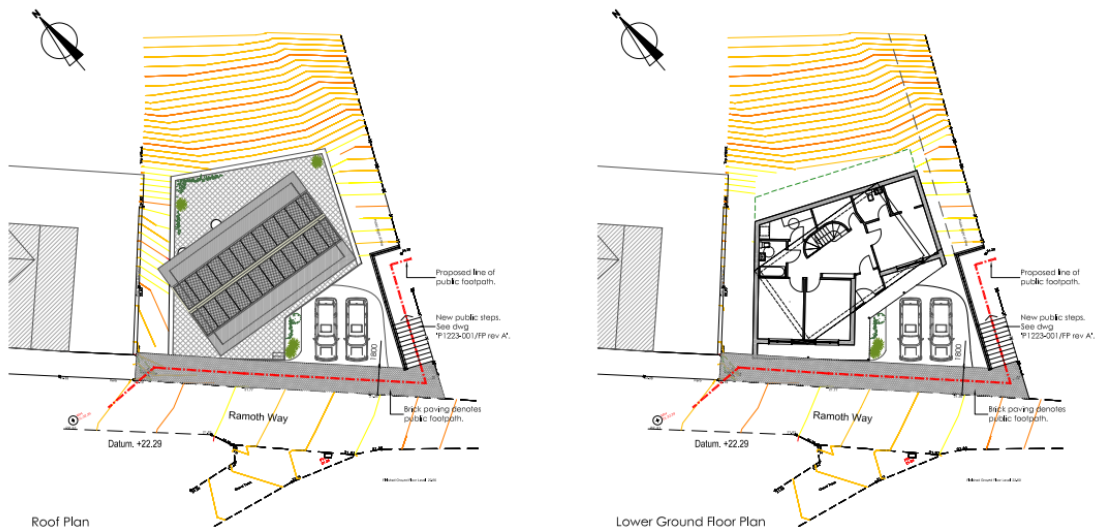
P1223-002/FP Rev B – Proposed Block Plan
